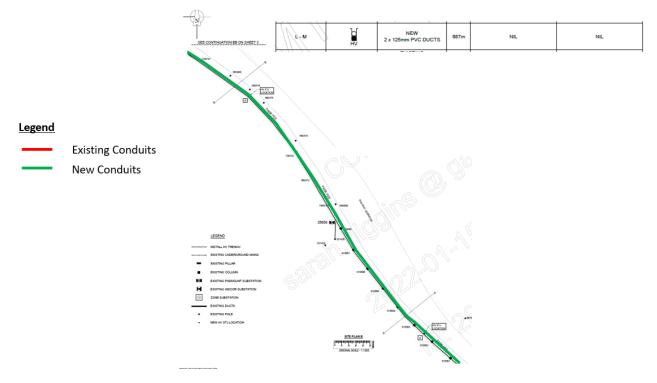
New conduit installation along Park Parade/ Alexandra Avenue
